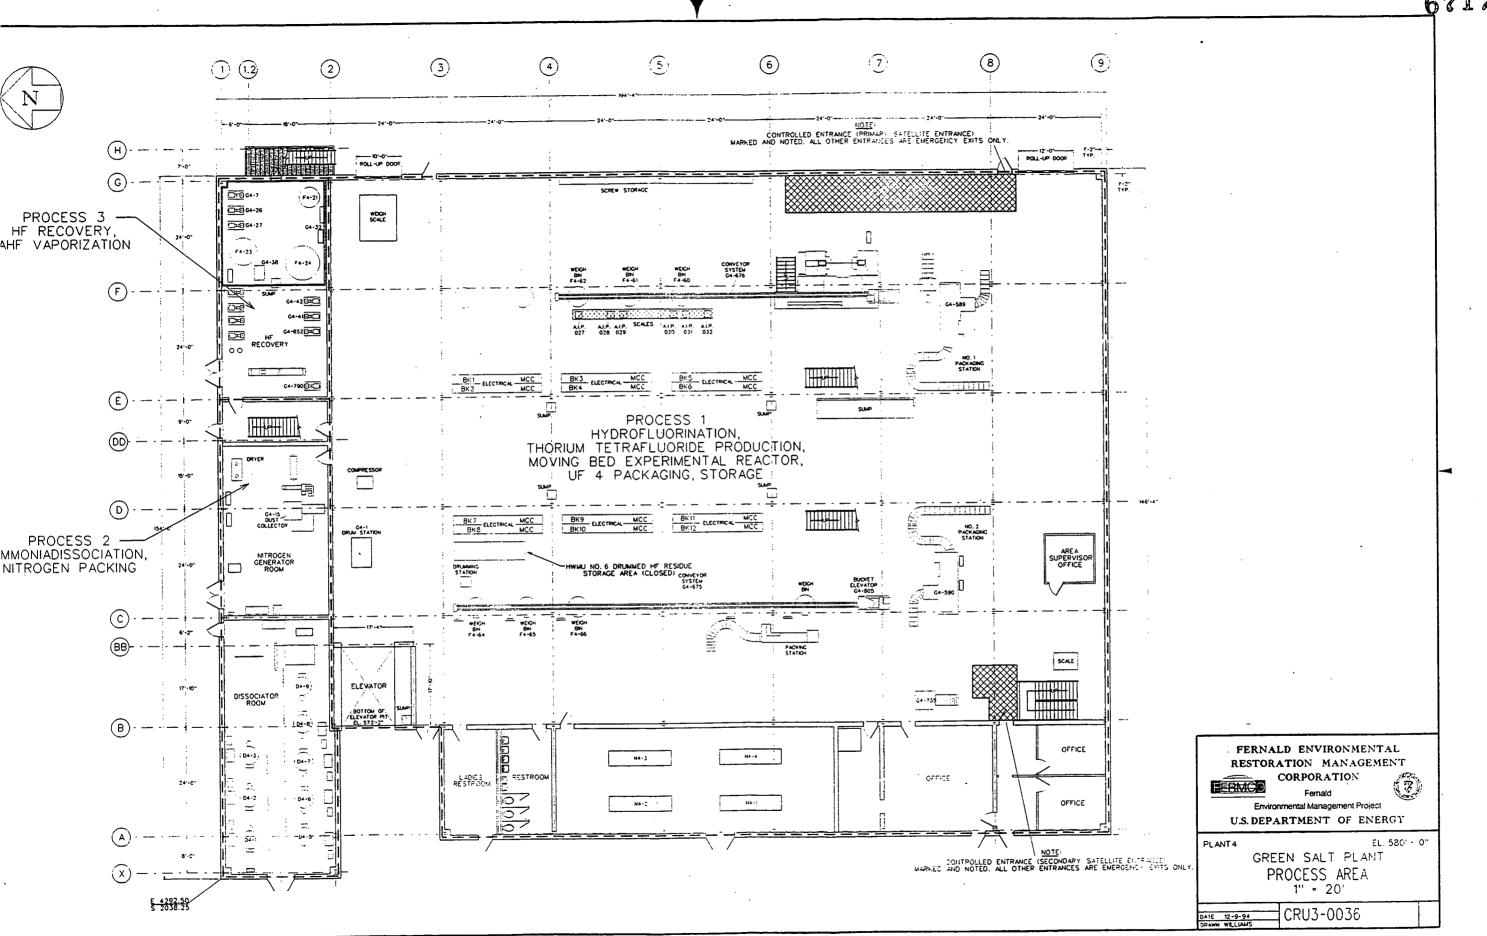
Floor Plan of Building 4A - First Level (ELEV. 580'-0")
